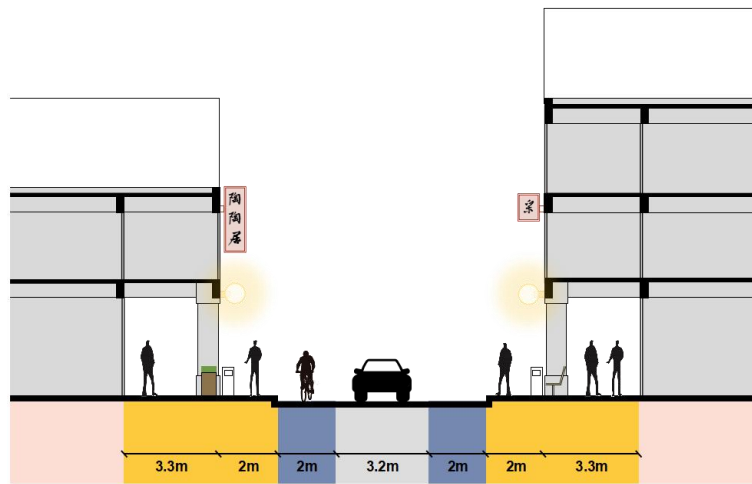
Cross-section of the Eastern Section of Shangjiu Road
